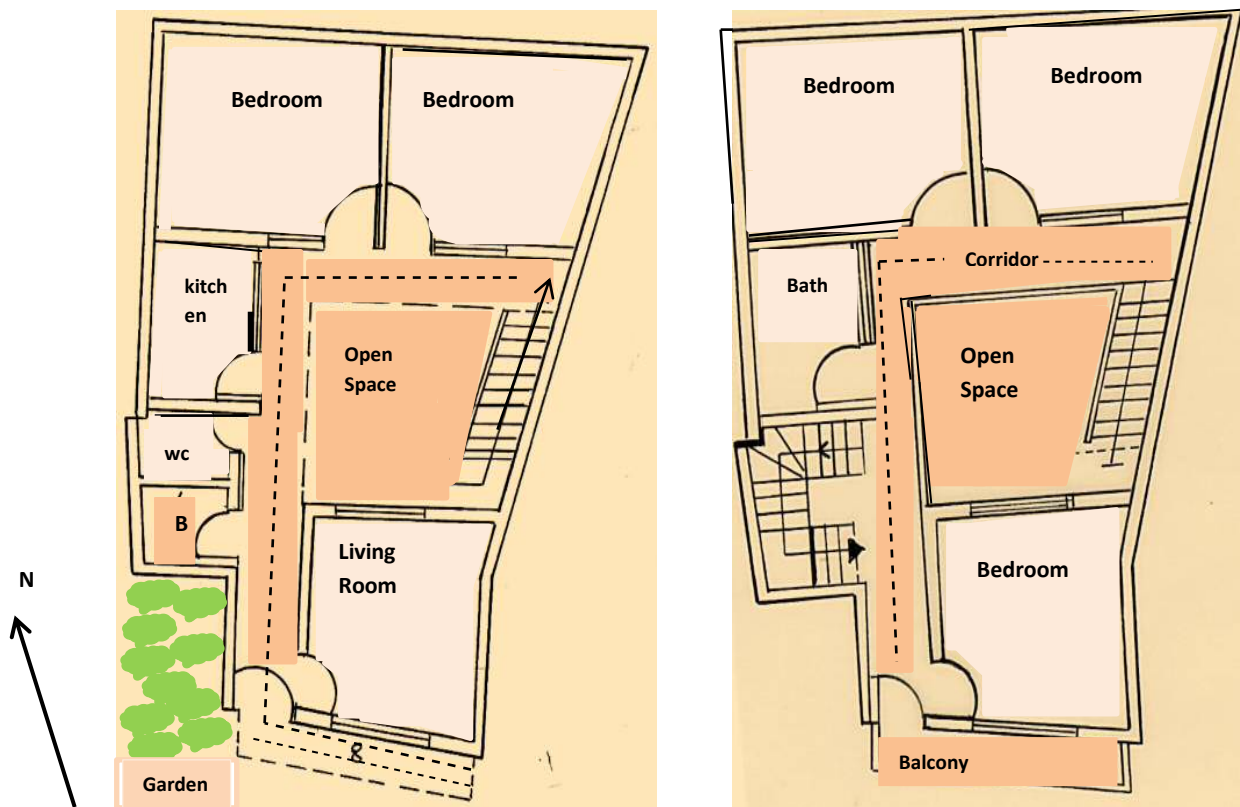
Ground floor level plan and first floor level plan of the modern house No. 3. Scale: 1:100
